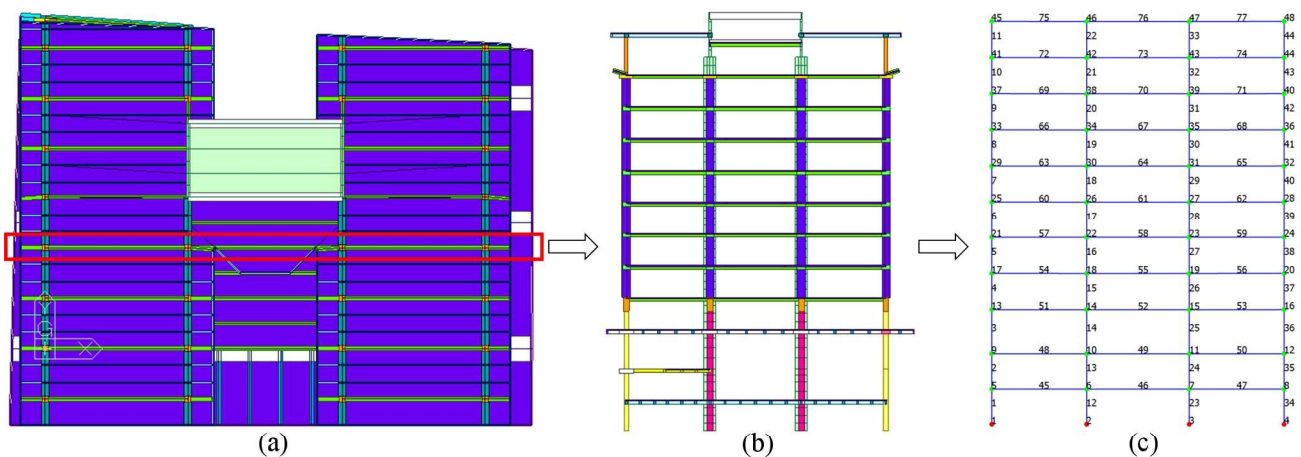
Structure details. (a) Typical floor plan of the building. (b) Plane frame chosen for modeling. (c) Modeled simplified frame
